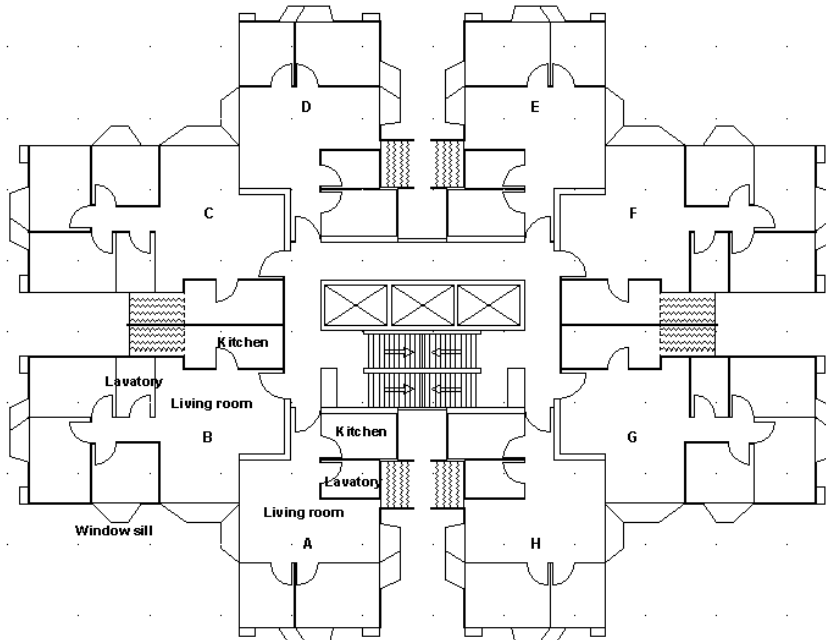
Typical floor plan for high-rise residential apartment buildings, typically around 30 stories high. In this plan, 8 units on each floor share interior corridors and the three lifts.
